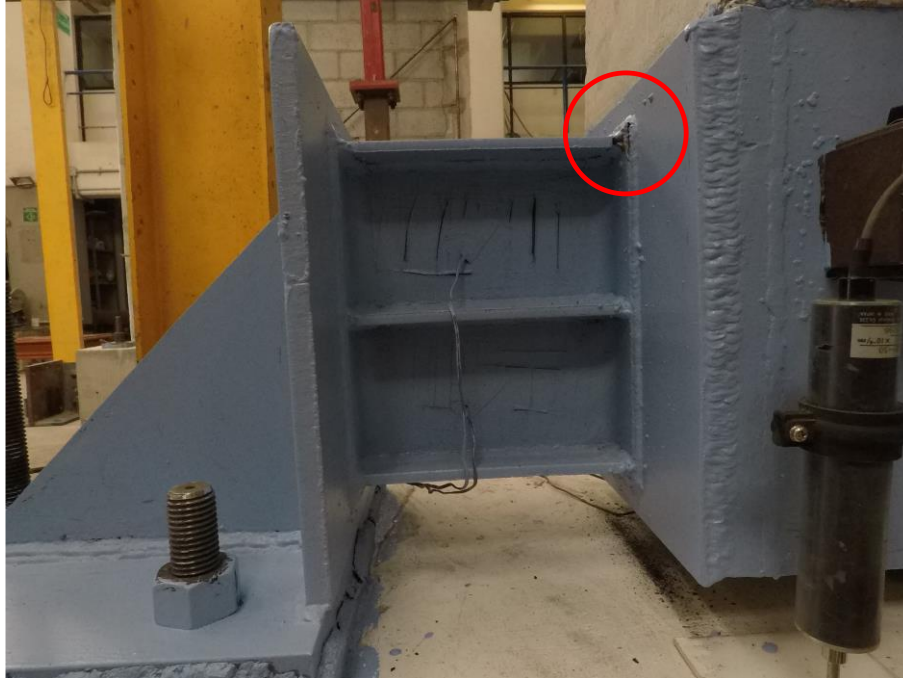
Weld failure at beam-damper interface due to tension forces.
